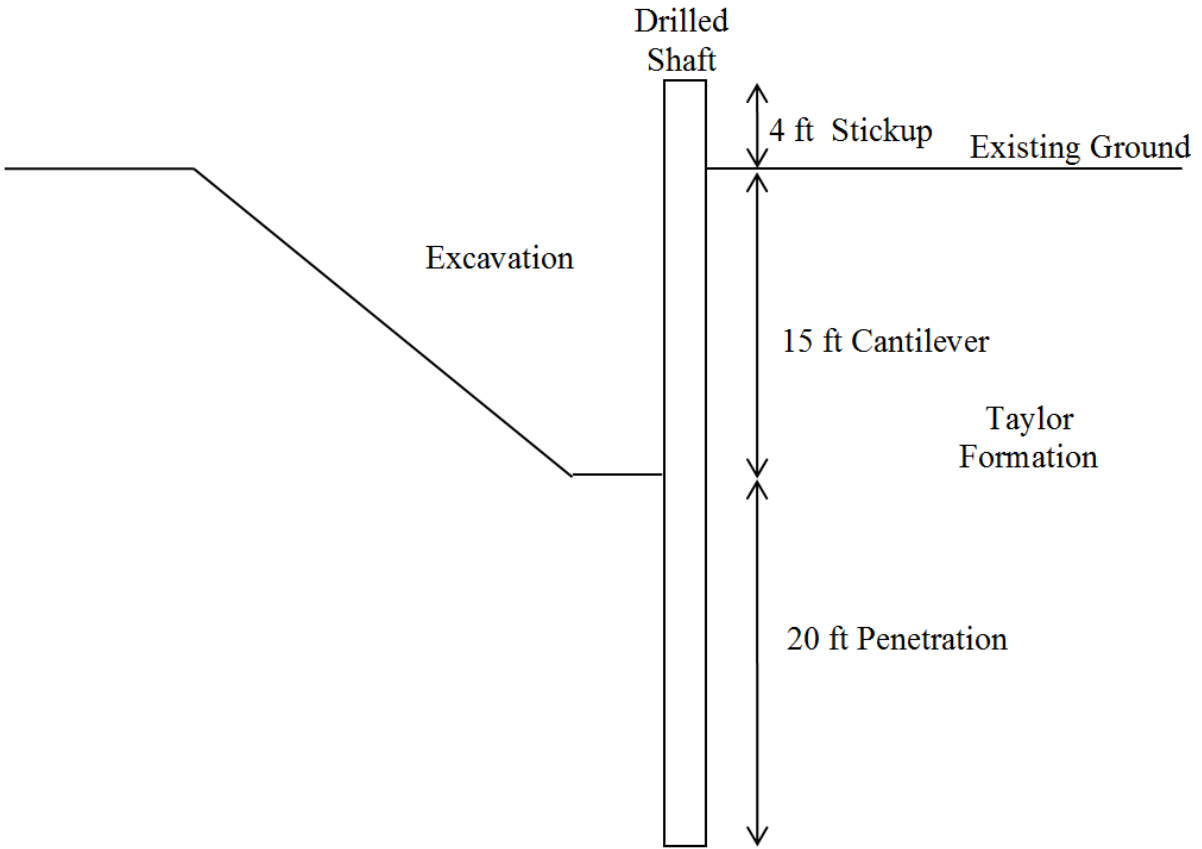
Cross-section of wall at center of excavation (Shaft No. 13)
